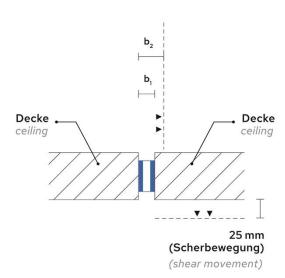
Horizontal ceiling joint construction. The maximum lateral expansion (b1 to b2) is 20 mm. The maximum skew of the parts (shearing distance) is 25 mm.
